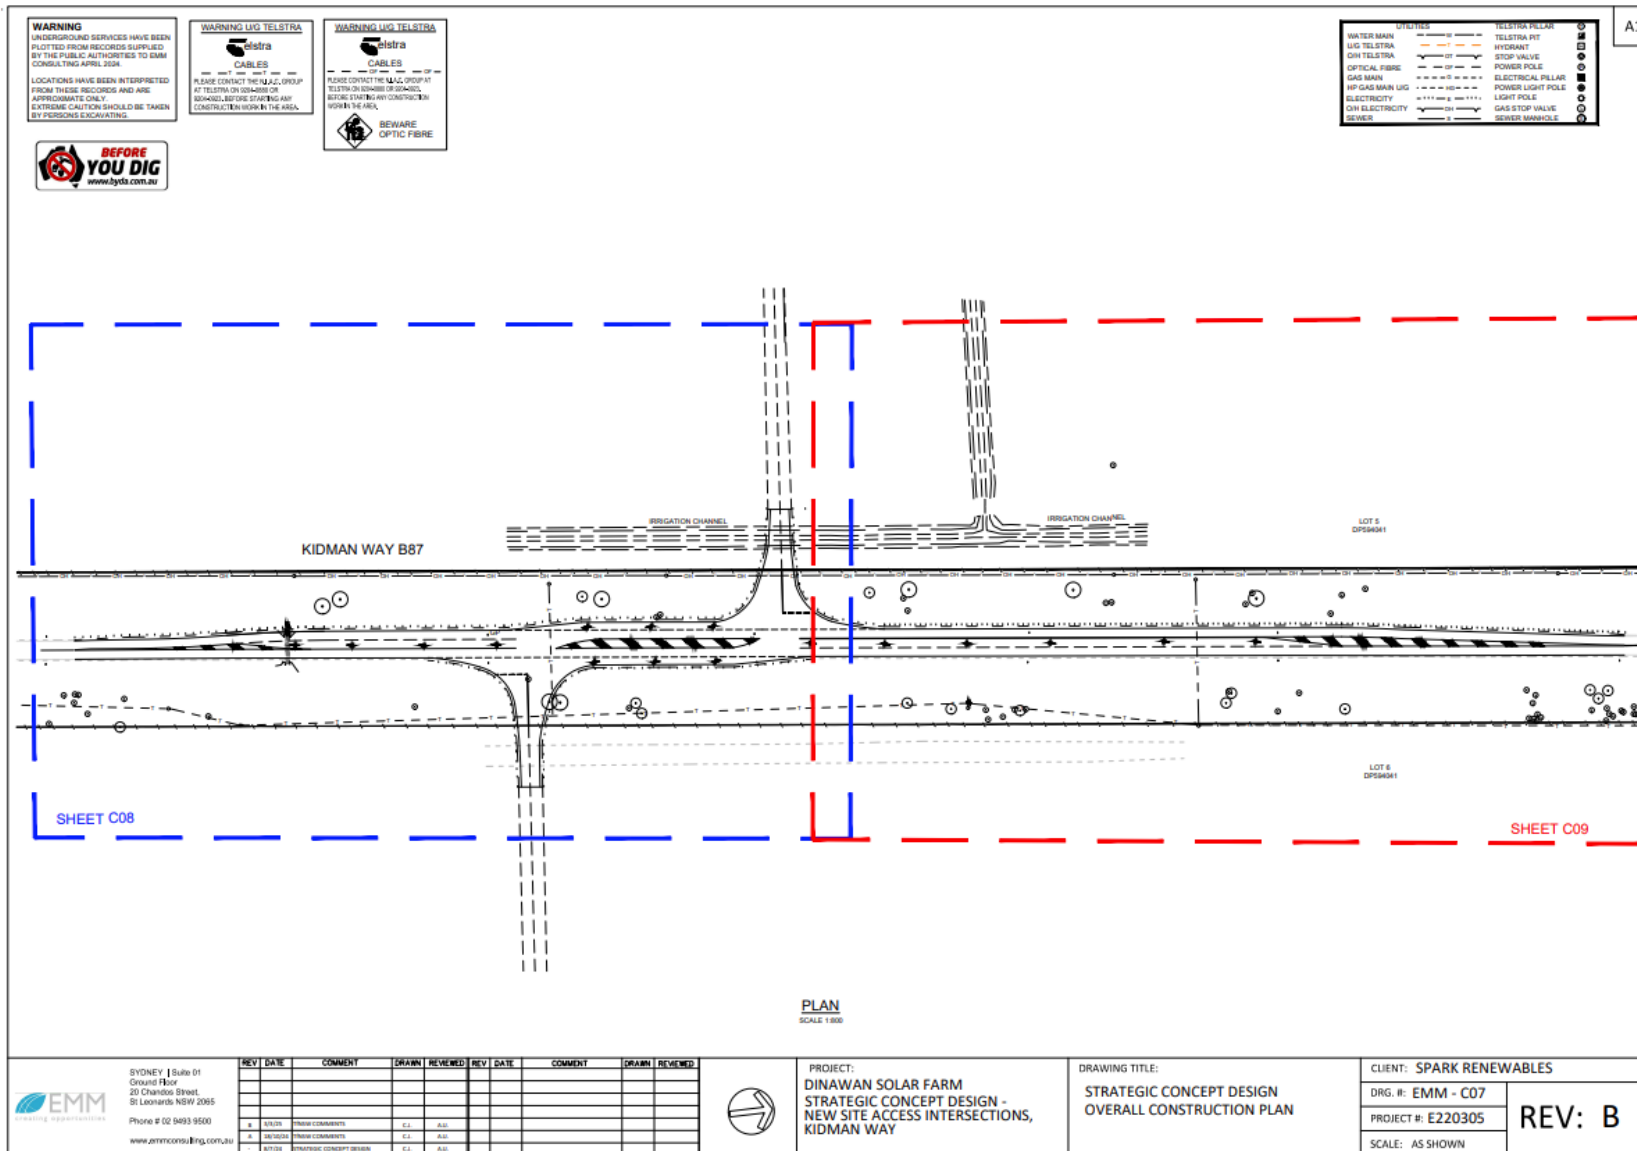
Proposed Kidman Way eastern access point and Kidman Way western access point
